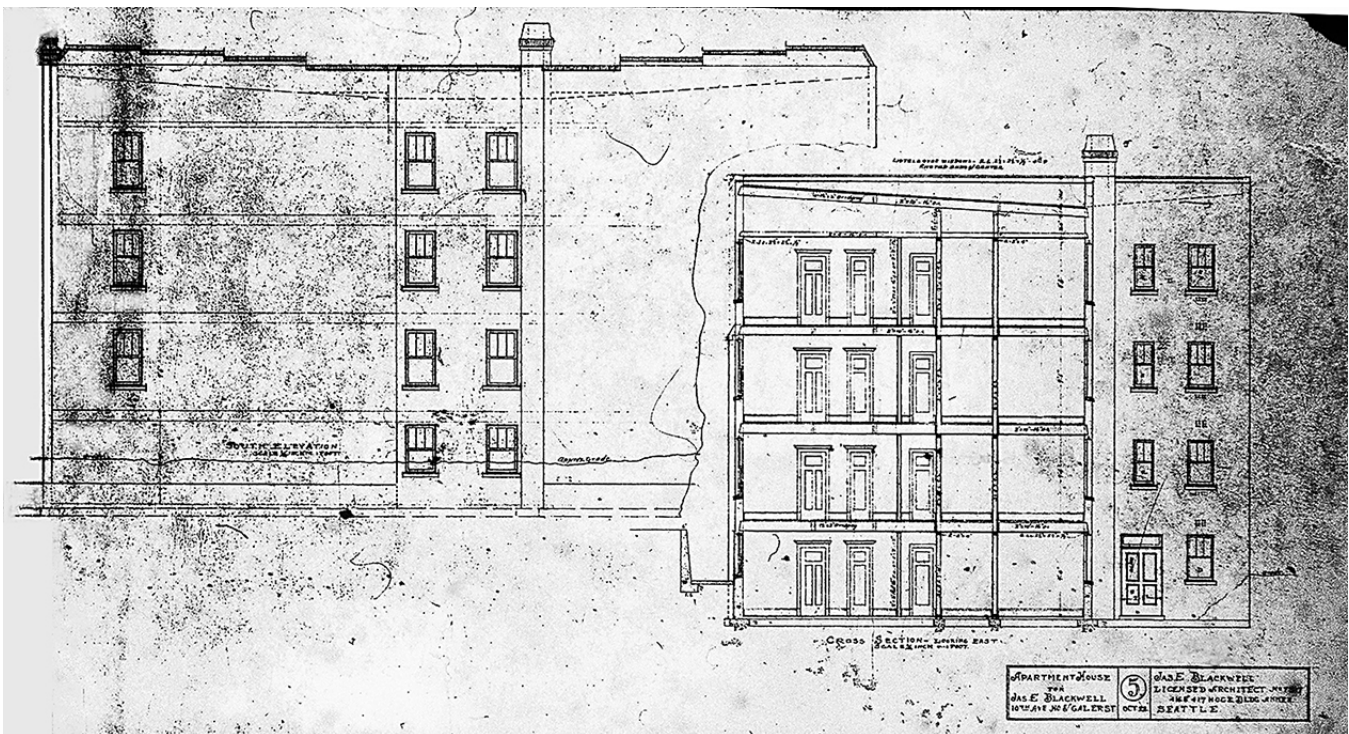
Original 1922 Blackwell blueprint showing south elevation and cross section looking east
